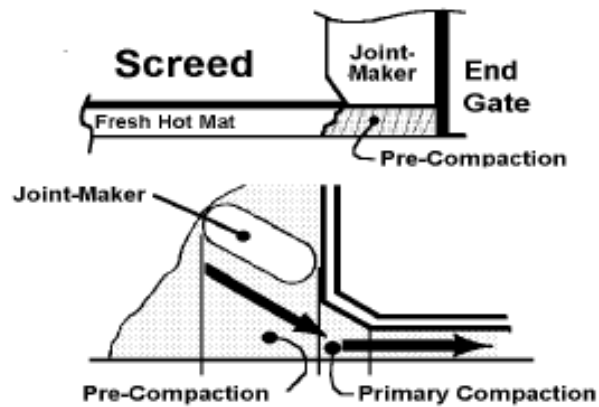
Joint maker construction (Fleckstein et al. 2002)
